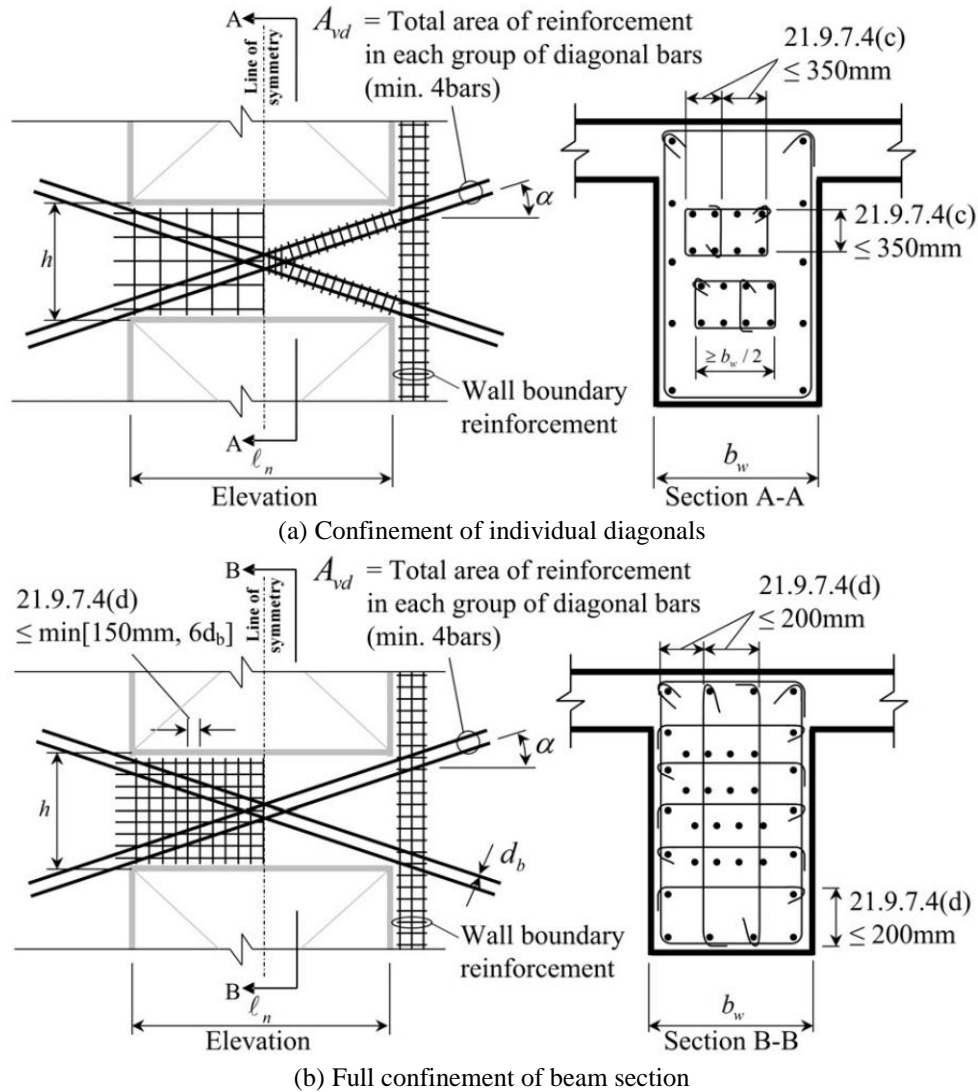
Design details for diagonally reinforced coupling beams in ACI 318-11
